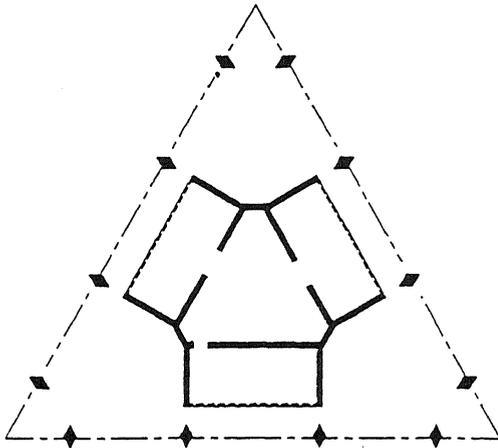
Floor plan of Torres de Miramar building, levels 1 and 2.
